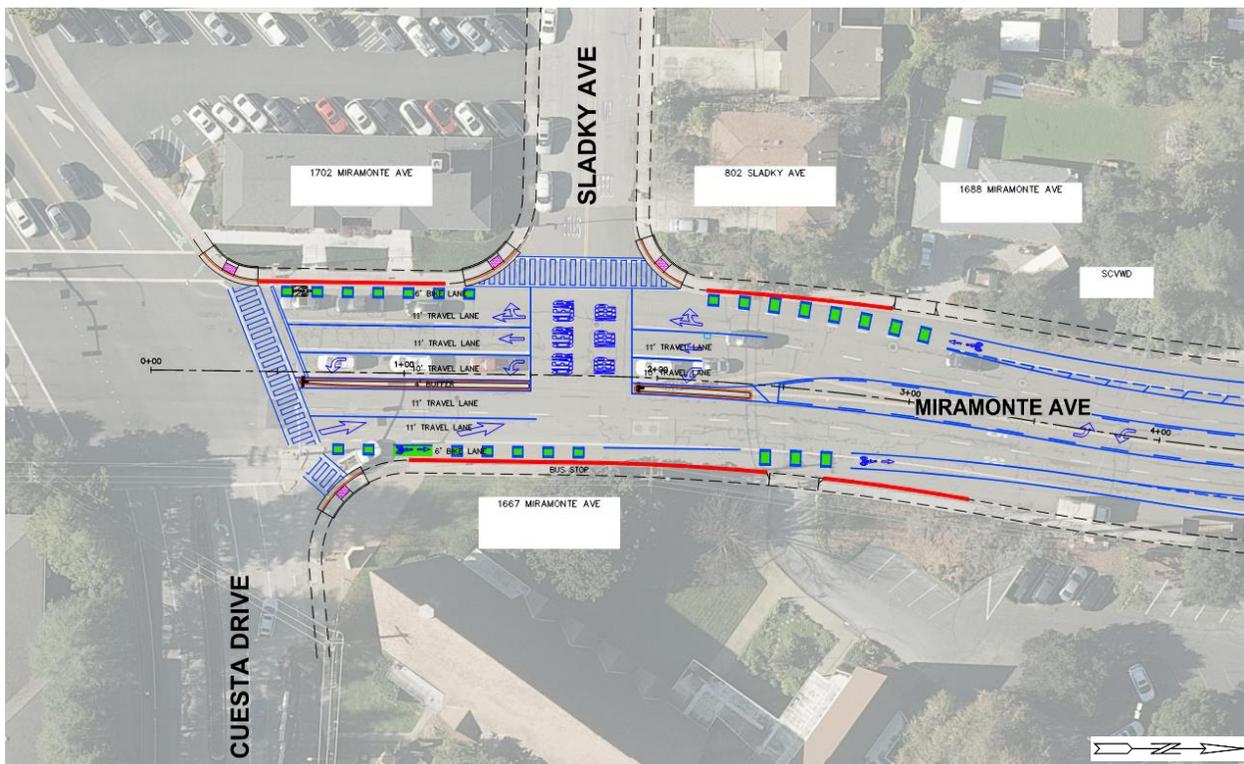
Cuesta Drive and Sladky Avenue Intersections
